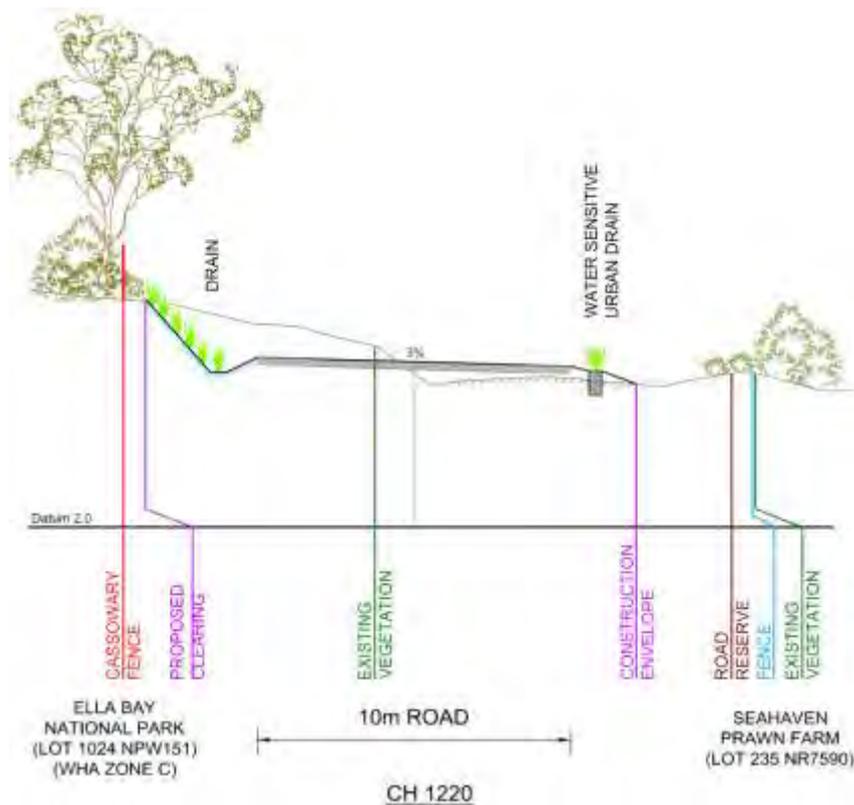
7 Typical western drain cross section Flying Fish Point to Heath Point Park.
